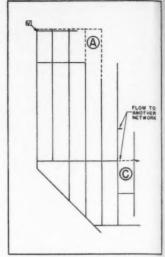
PROPOSED PLAN FOR REIN-FORCEMENT BY INSTALLATION OF MAINS "A" AND "C"
